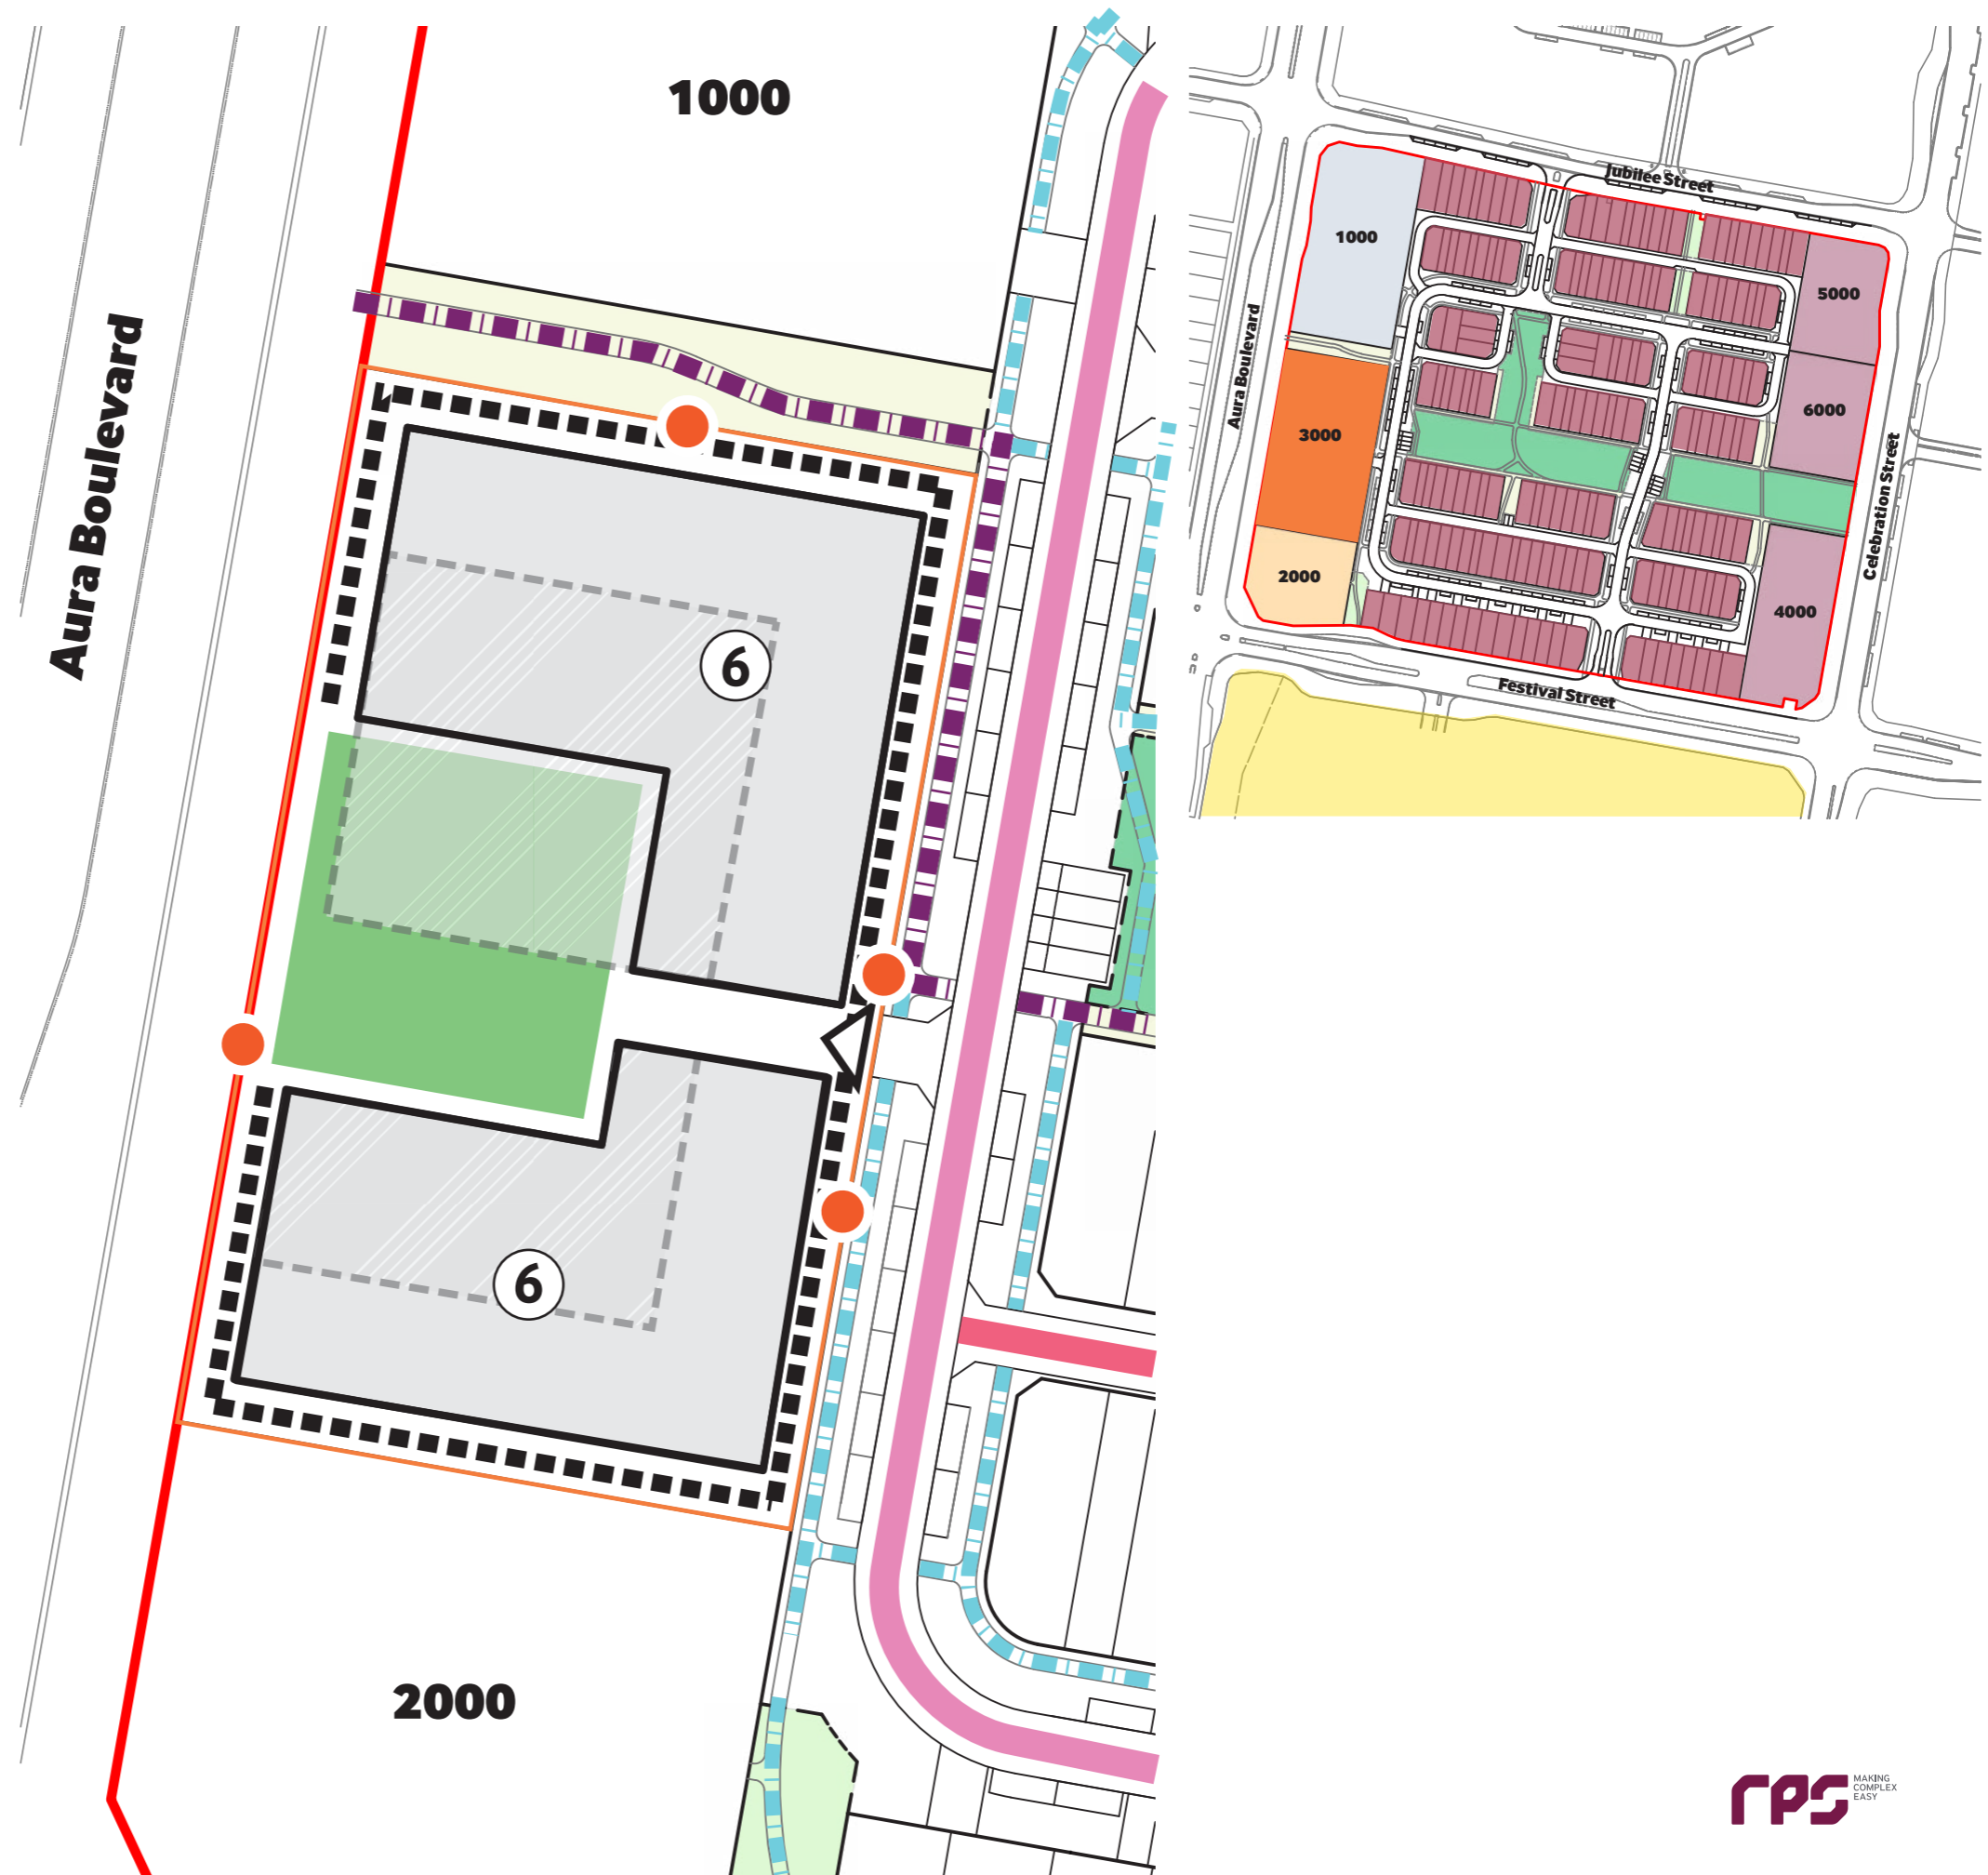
SUB-PRECINCT 9.1B - PLAN OF DEVELOPMENT
